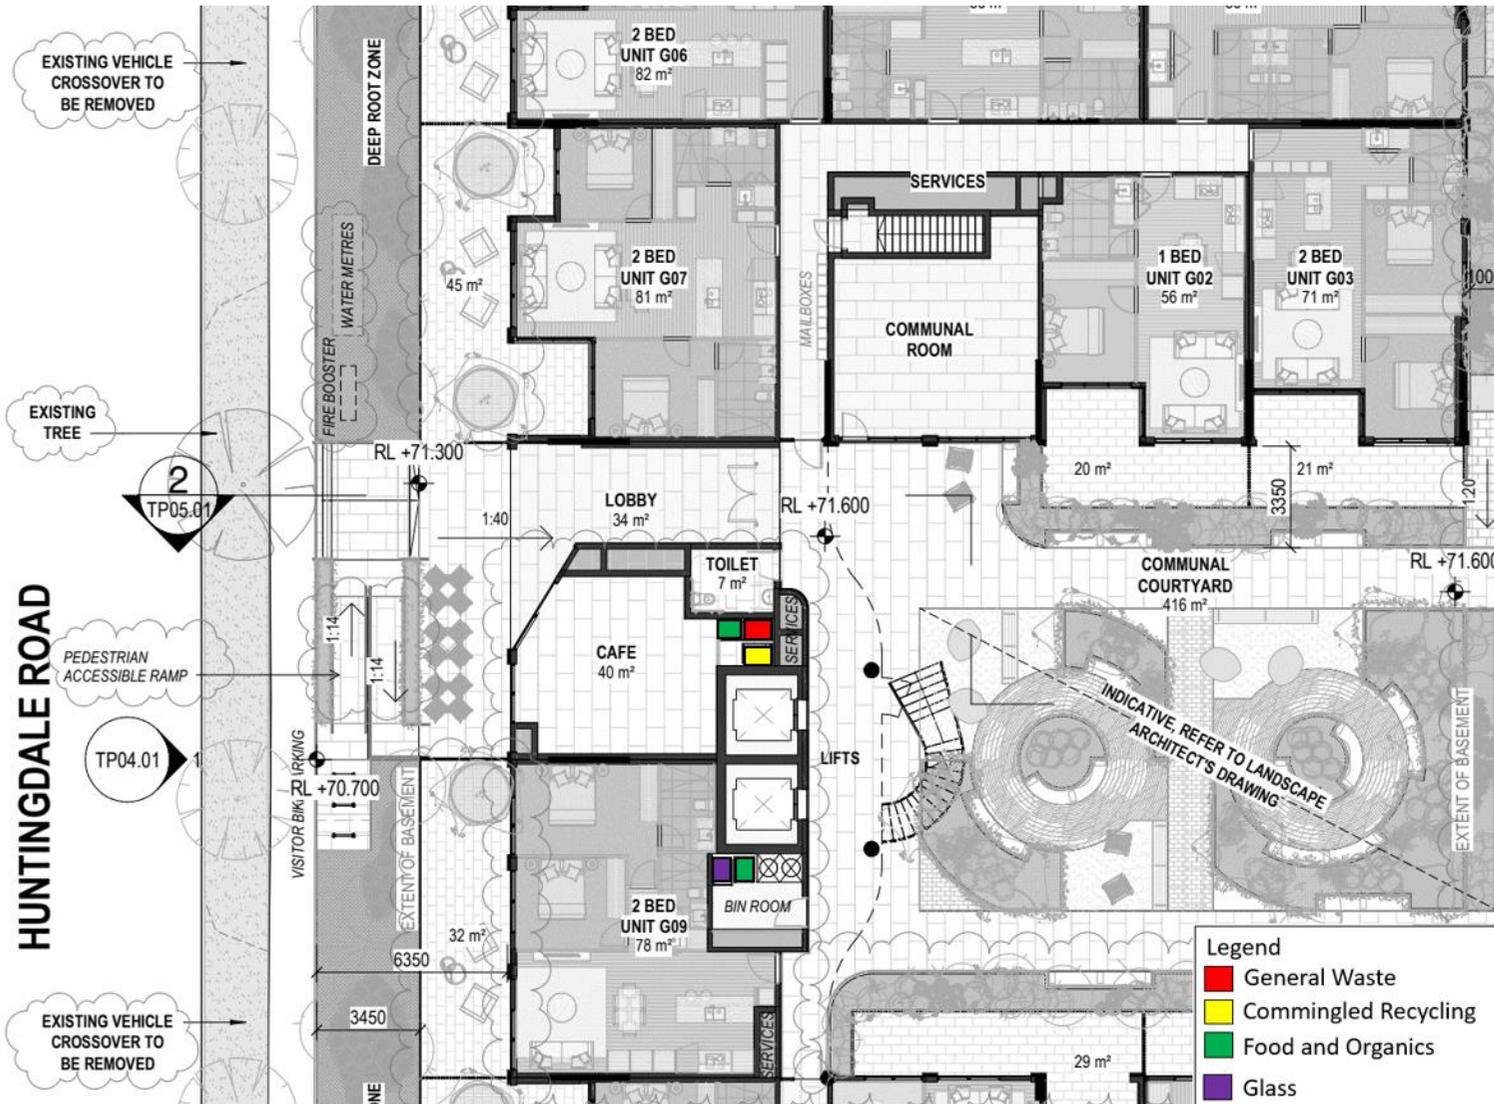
DEVELOPMENT PLAN – CAFÉ AND APARTMENT GROUND FLOOR BIN STORAGE AREA – FUTURE
